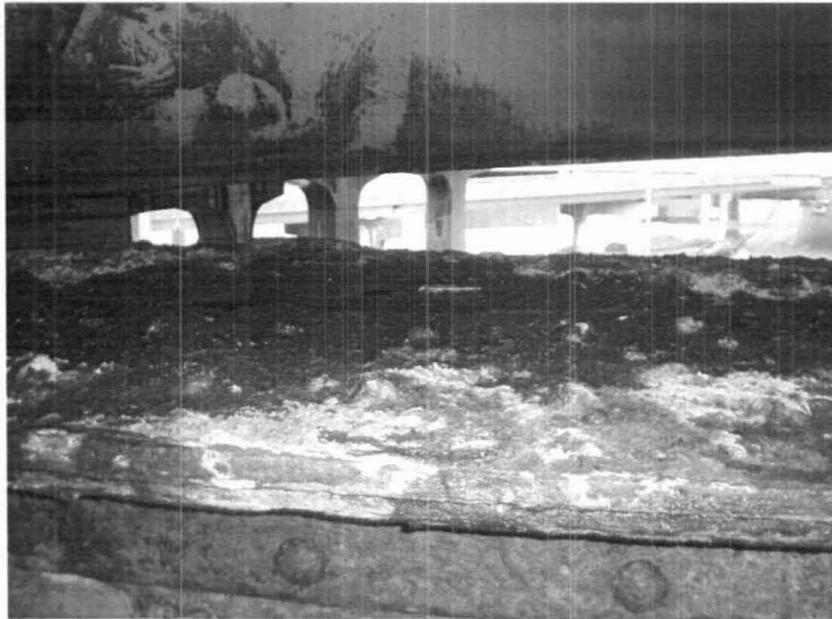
Heavy laminated rust with section loss in the top flange cover plate of the steel pier cap (pier 1).
